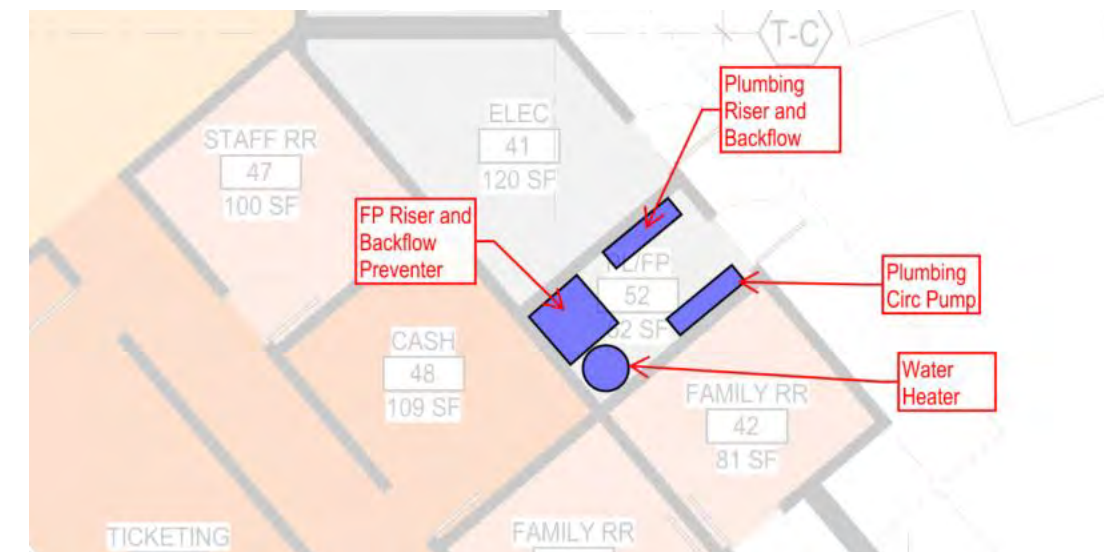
ENTRY BUILDING PLUMBING EQUIPMENT
